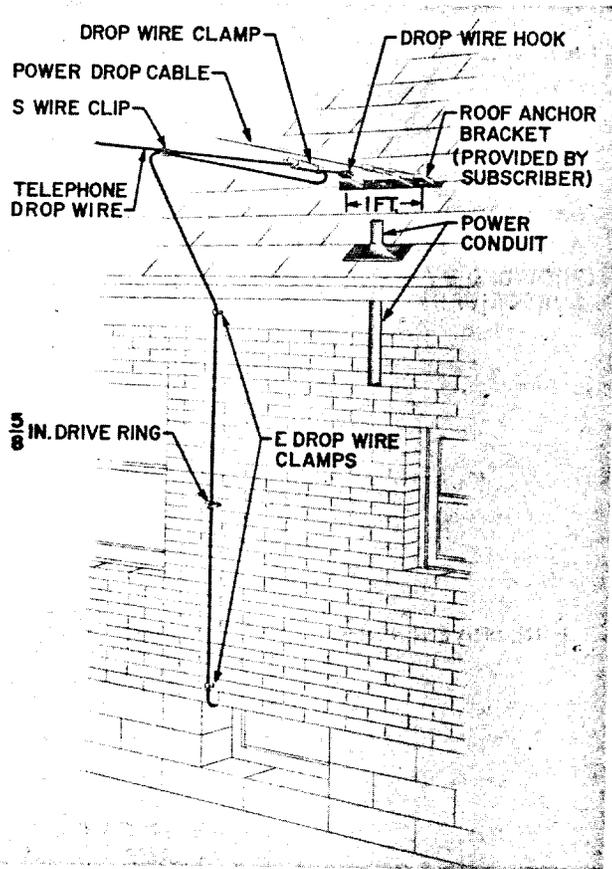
Drop Wire Attached to Roof Anchor Bracket
